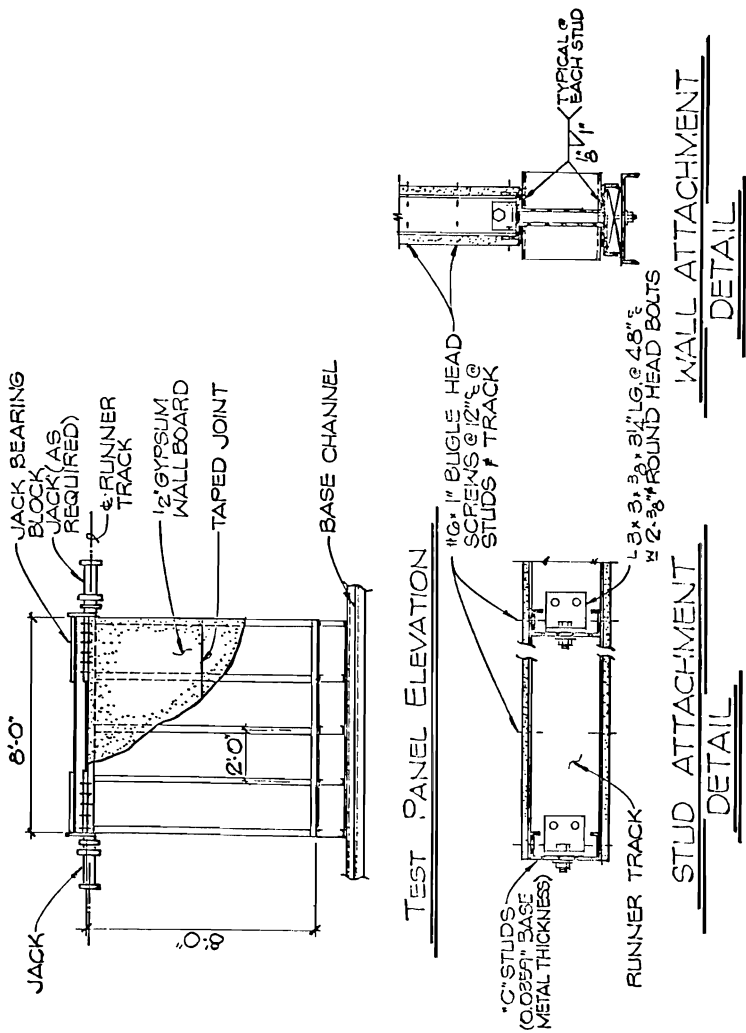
Test Assembly Plan & Details - Wall Type "Q"
